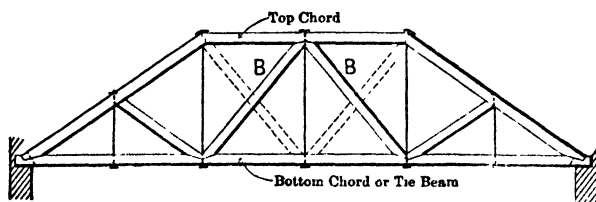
Queen-rod Truss. Spans from Forty to Fifty-two Feet
